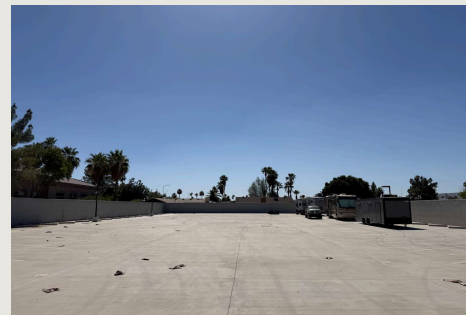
· Paved yard looking west — 40 striped & outlined stalls
